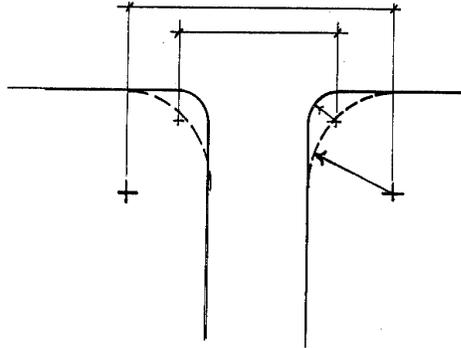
Plan-view diagram of a street intersection. Reducing the radius of street corners slows turning vehicle traffic and shortens pedestrian crosswalks.
